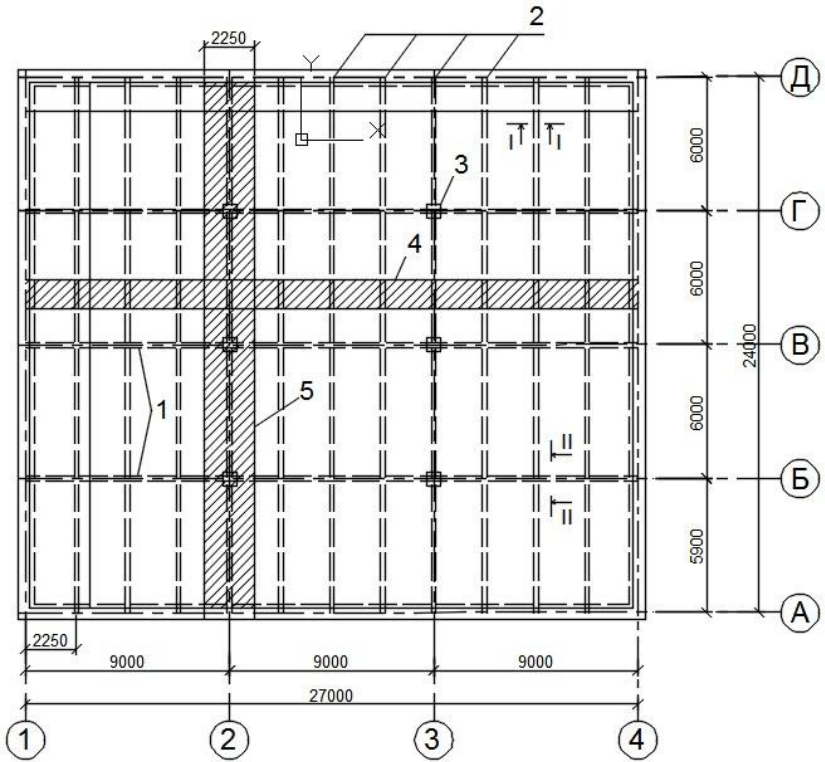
To calculate a monolithic ribbed floor with beam slabs:
